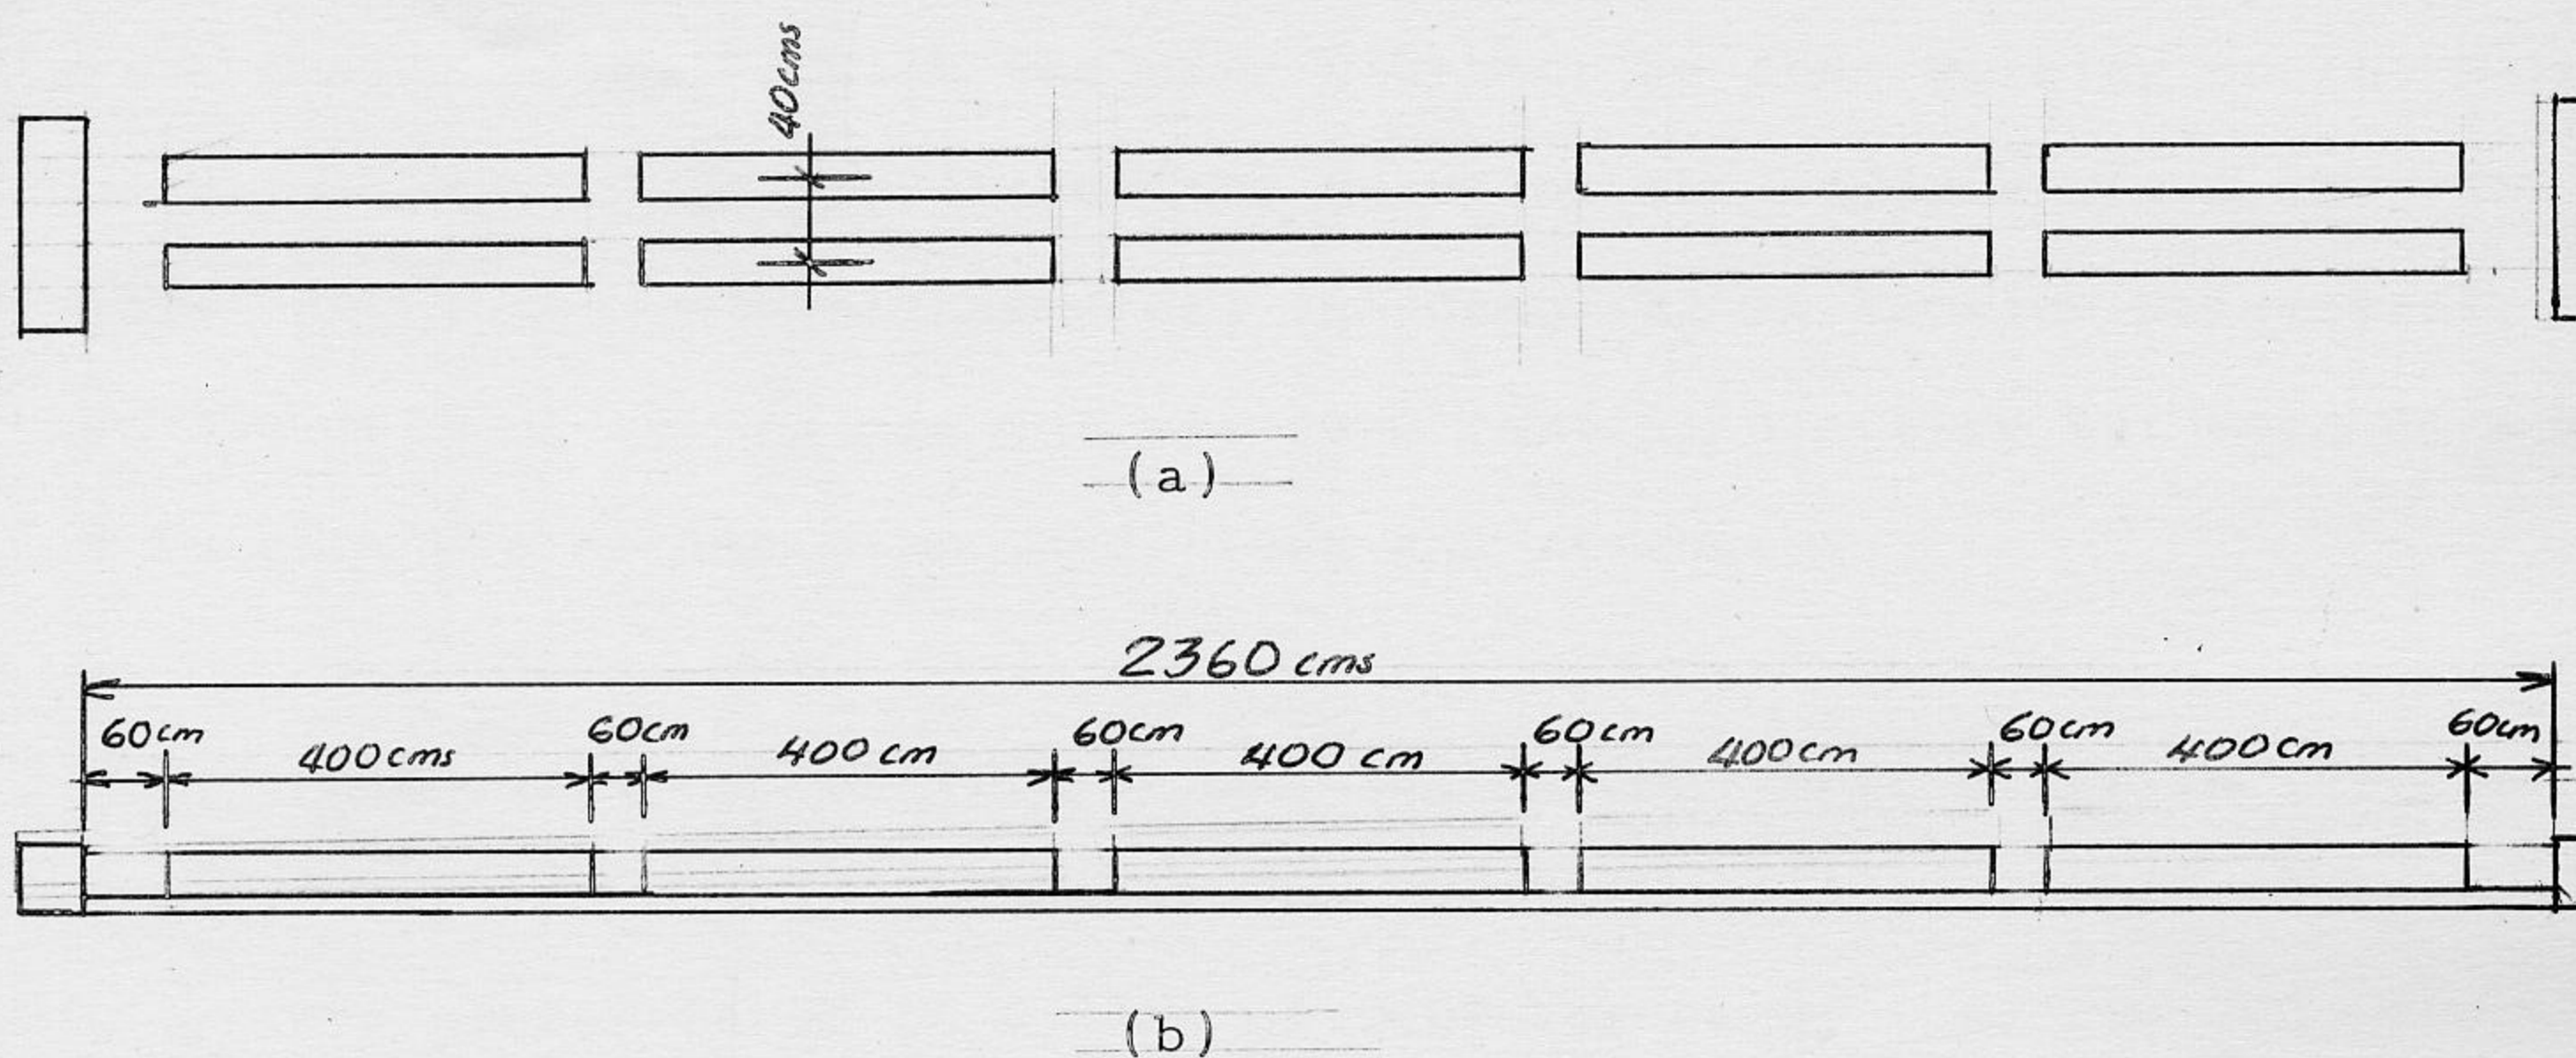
General Arrangement of Casting Beds and Bulkheads for the Prestressed Test Beams: (a) Plan, (b) Elevation.
